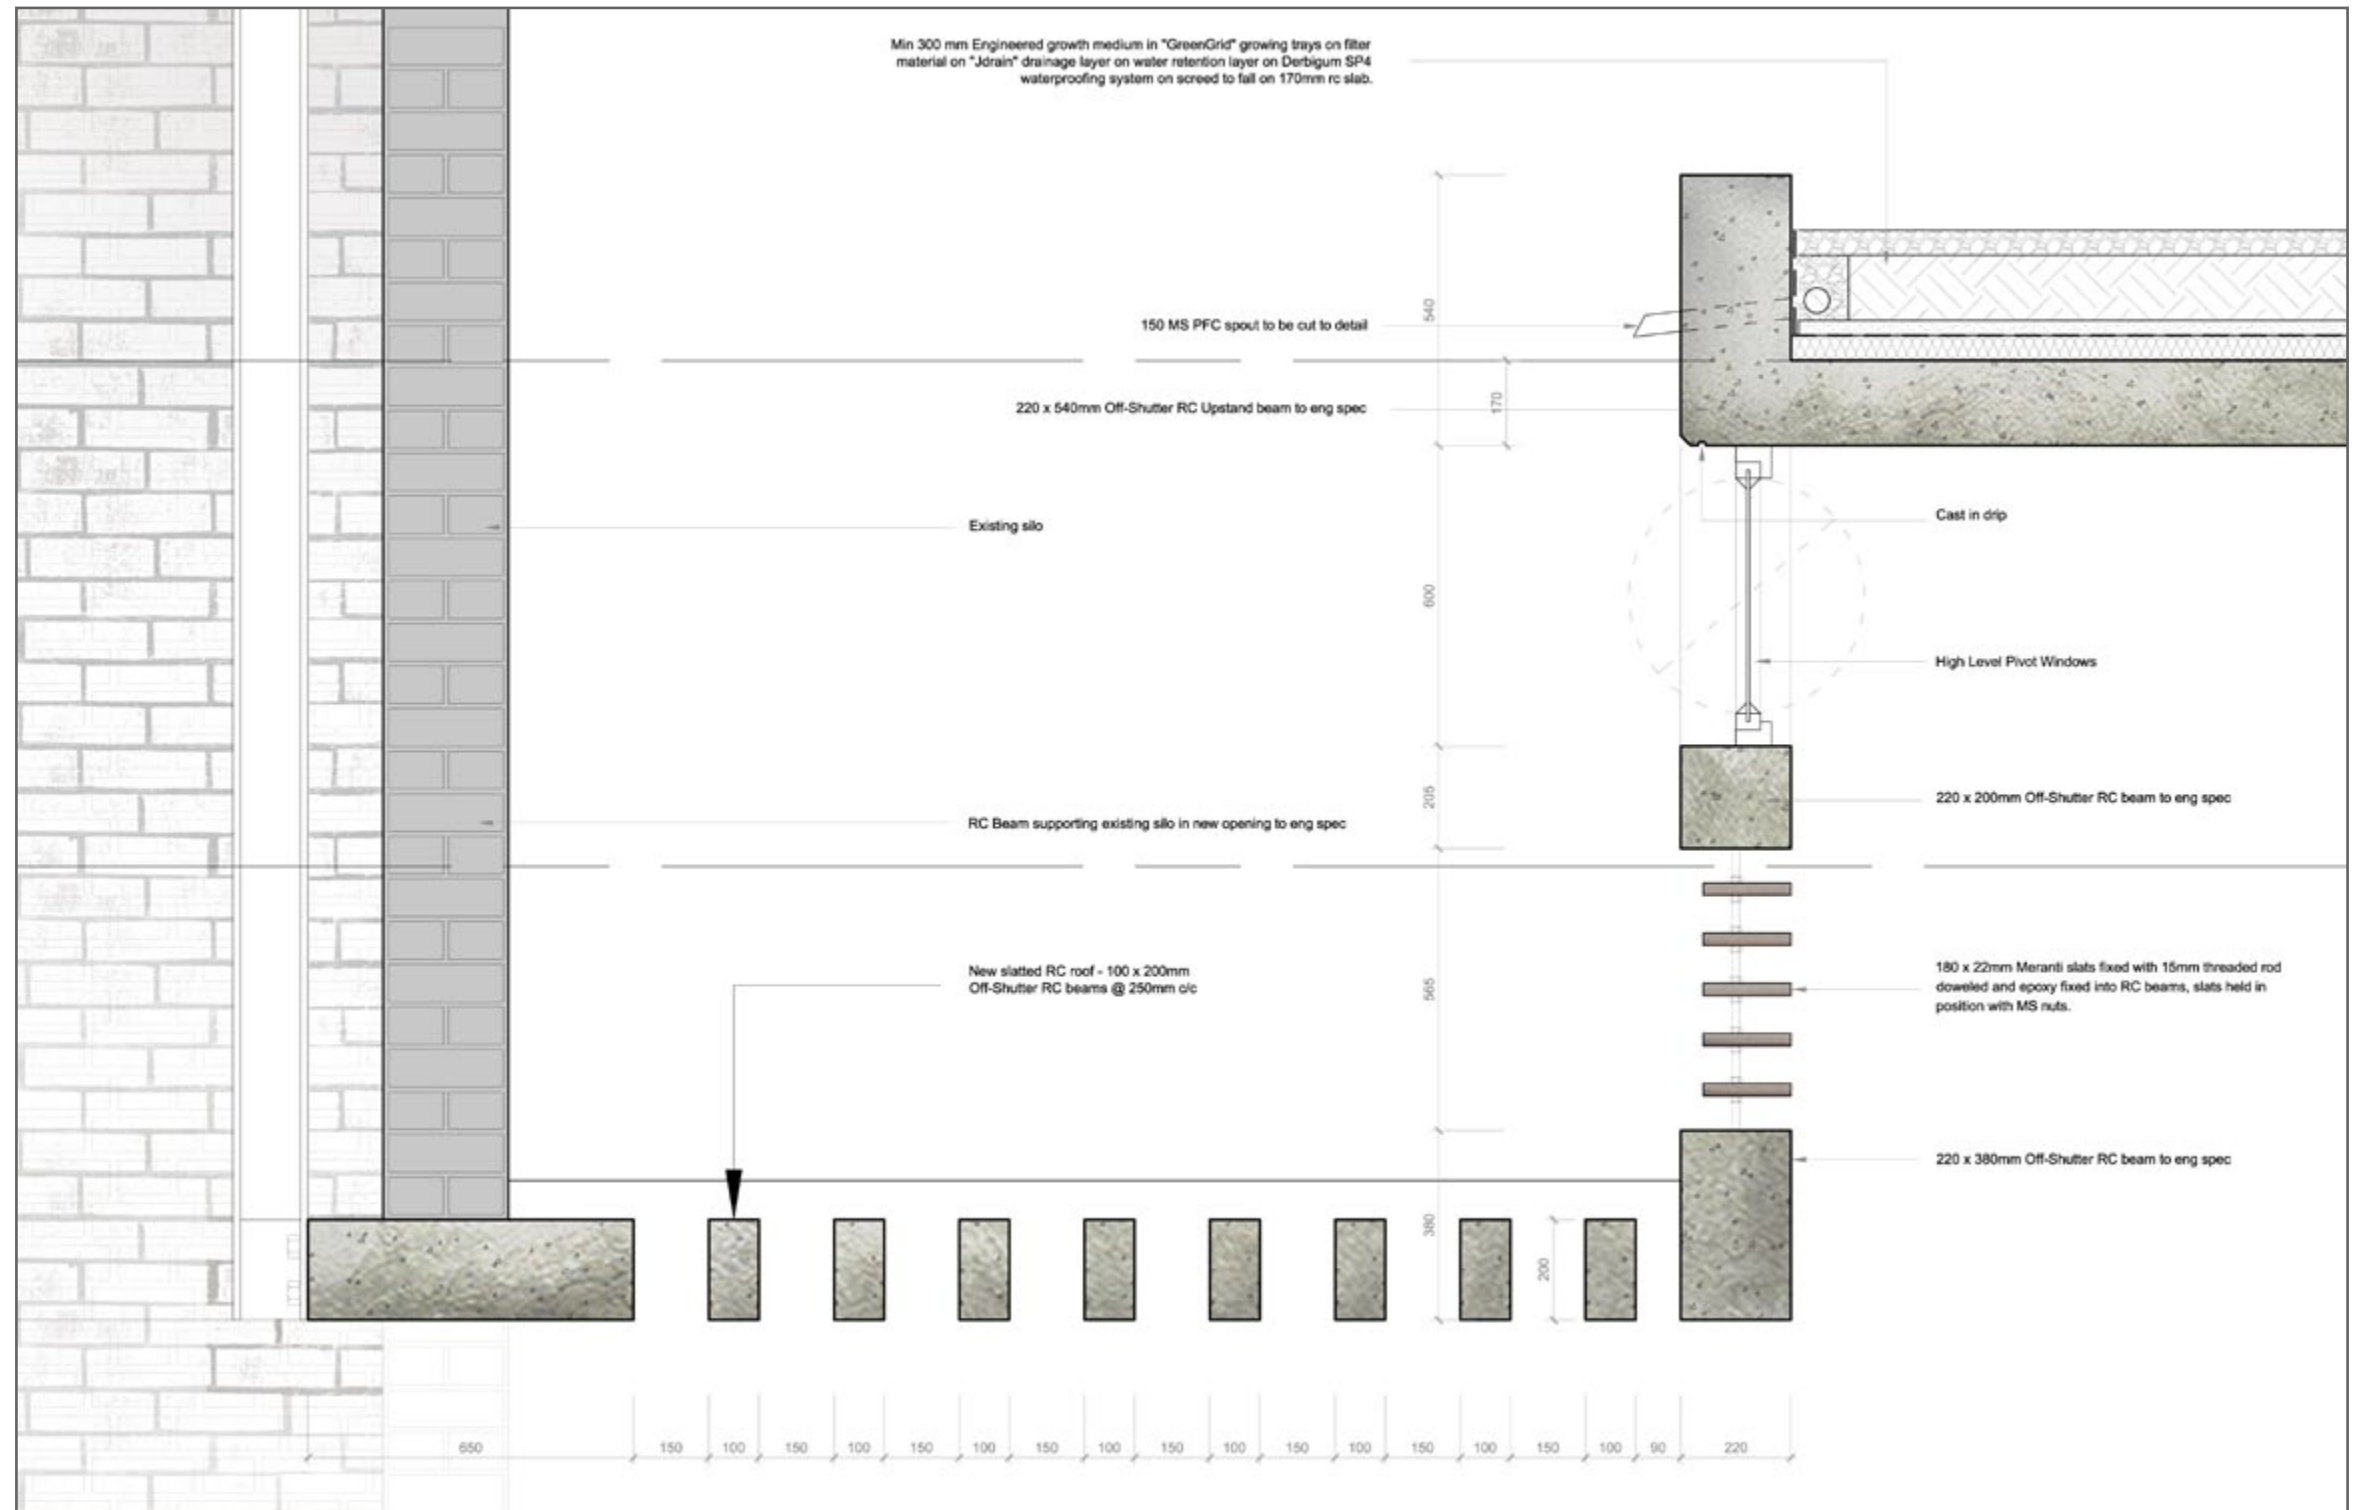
Mediating connection detail between existing & new (Author: 2012)
